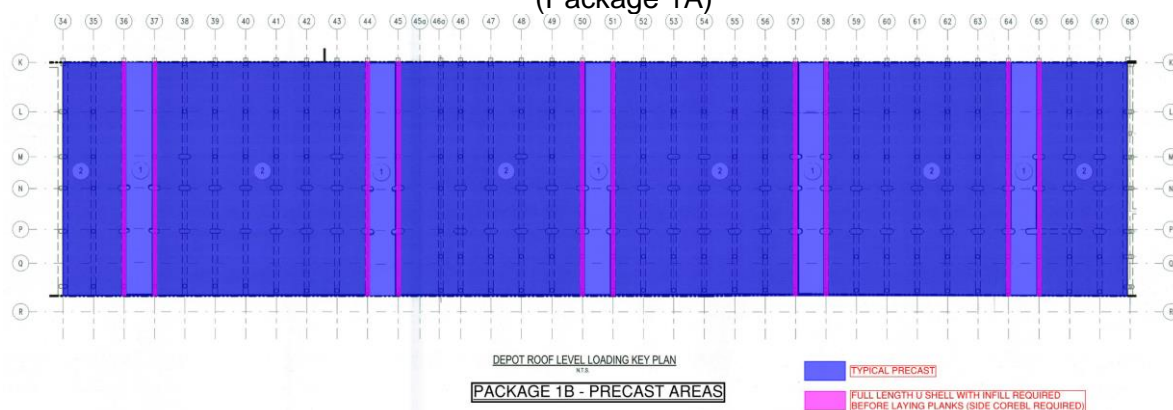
of Extent of Precast RC Beam and Slabs for OYB construction (Package 1B)
